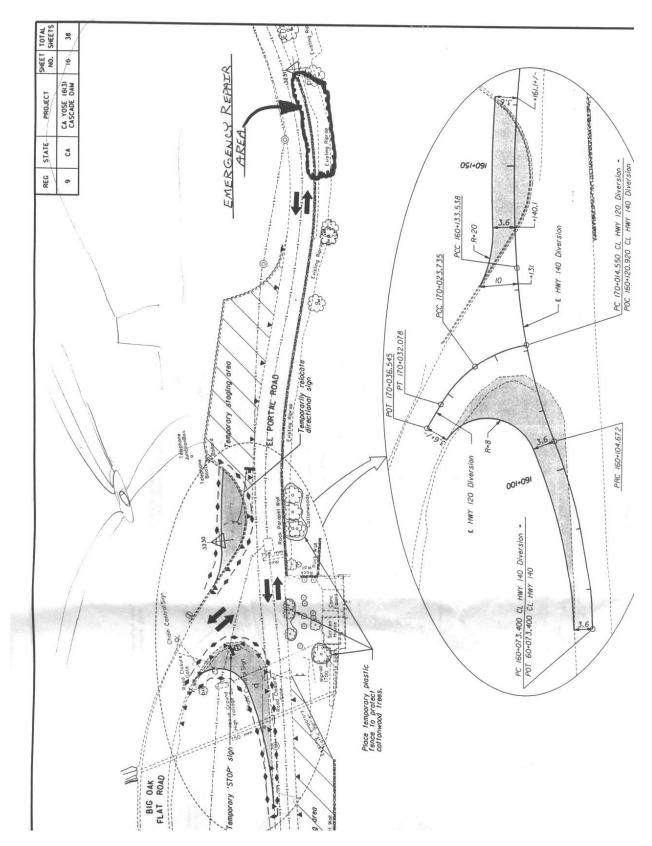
El Portal Road Embankment Emergency Stabilization, Location
